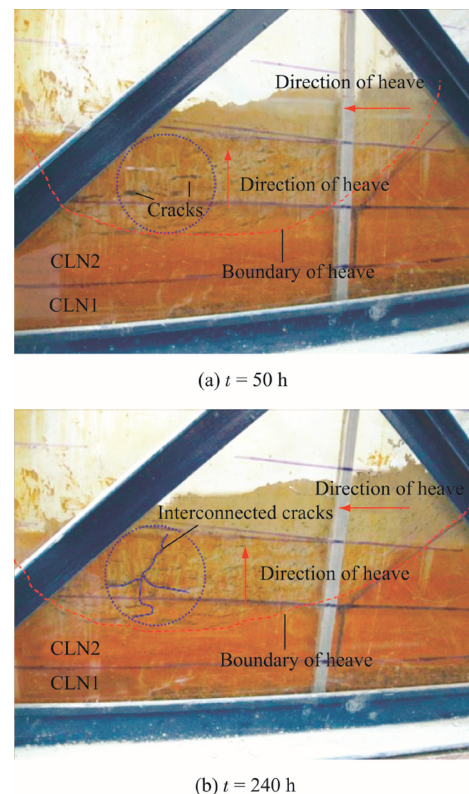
Seepage failure mode in downstream foundation of embankment (front view).
